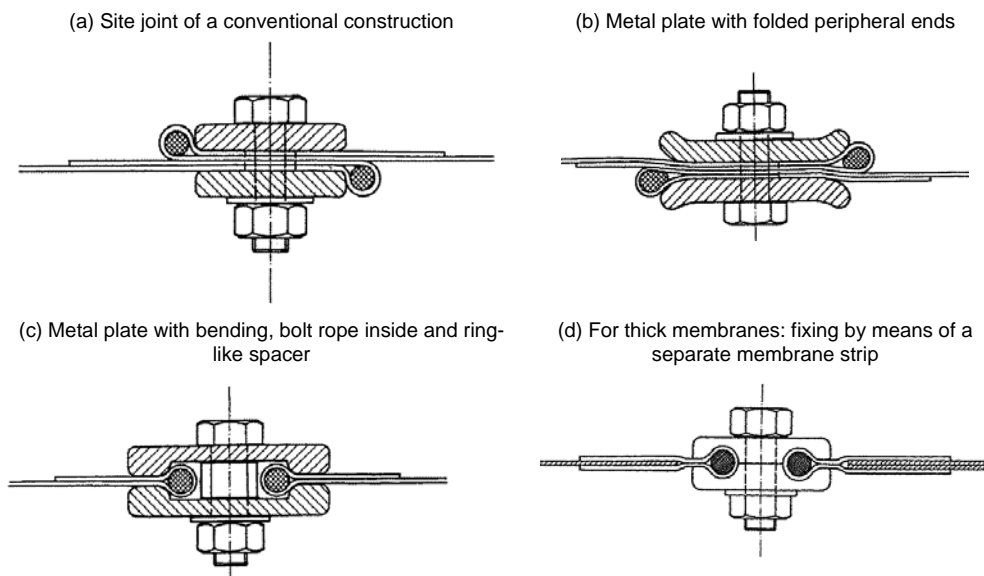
Typical exemplary clamped (bolted) membrane joints with metal plates, bolt ropes and bolts according to [Bub97]
